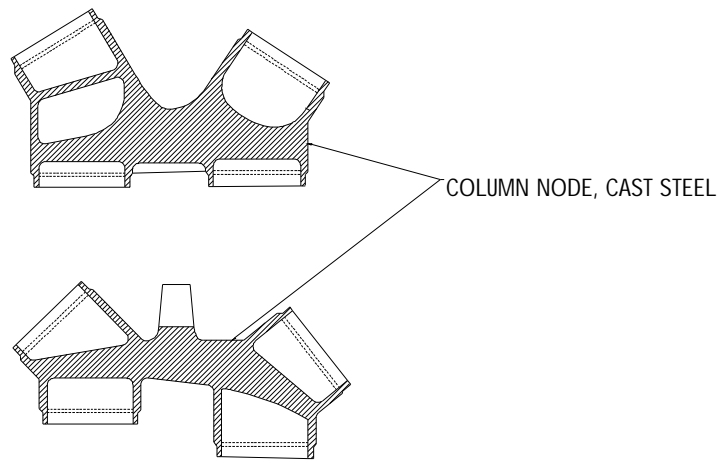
Cross sections of the tubular columns nodes made out of cast steel.- Stuttgart Airport.
